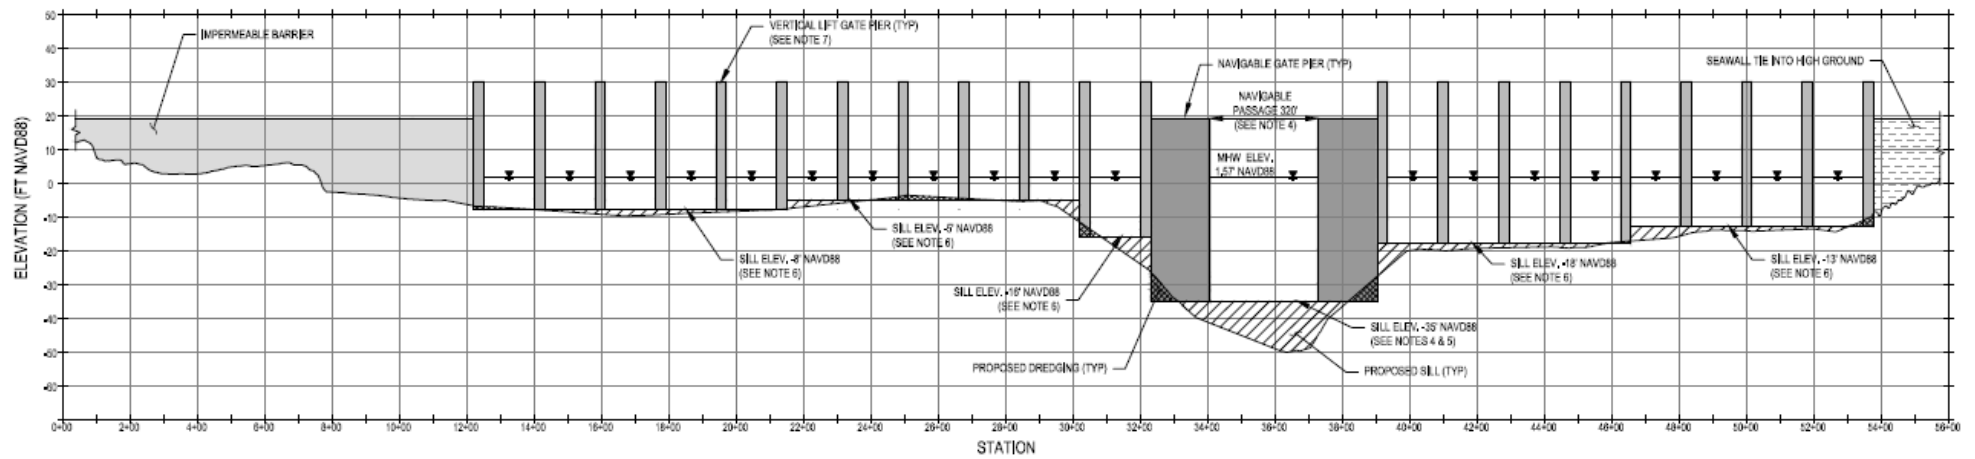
Great Egg Harbor Inlet storm surge barrier layout
